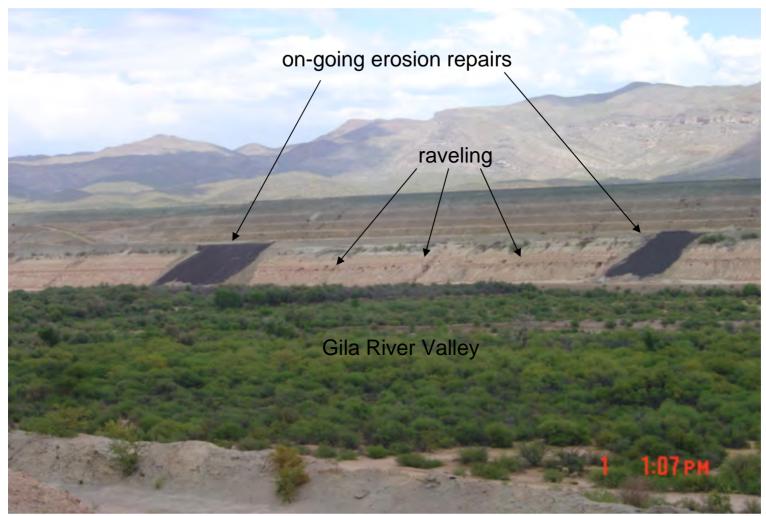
through 17 illustrate panoramic view of southwest (this photo) side and corner of Impoundment AB looking from south to north.
